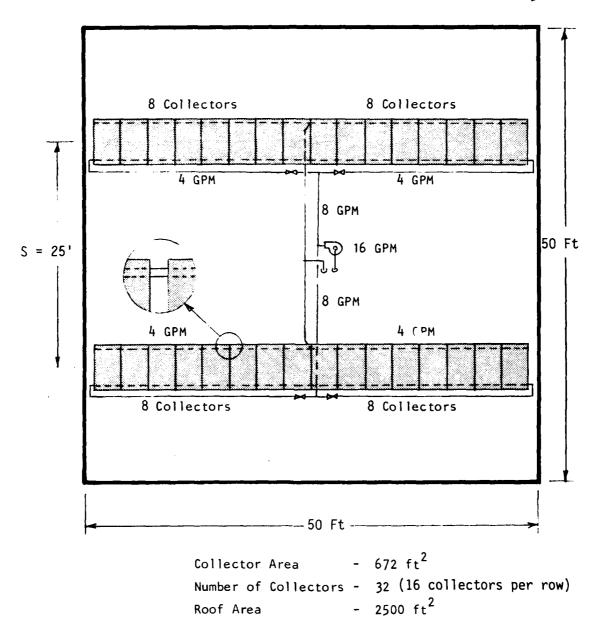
PLAN VIEW OF ACTIVE SYSTEM ROOF MODULE
